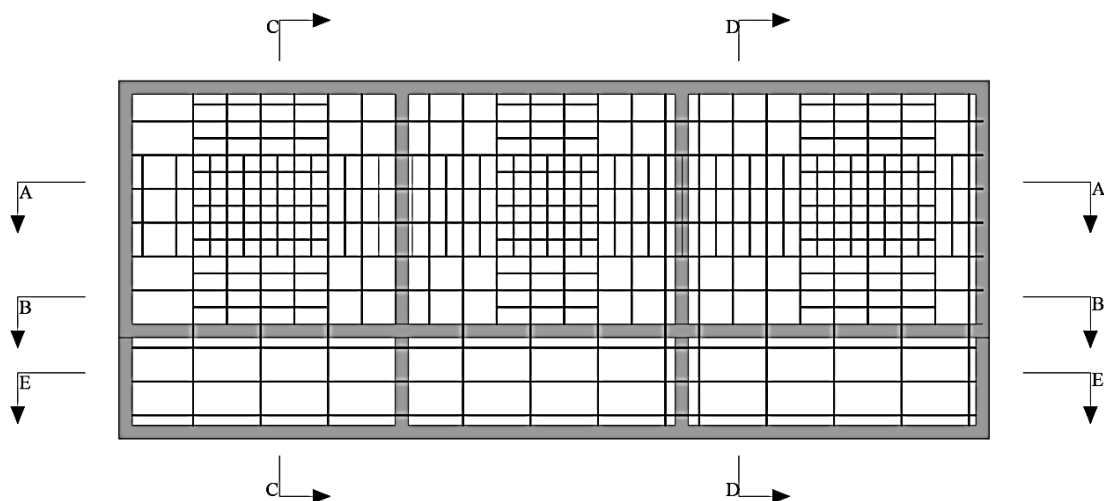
Plan view showing the distribution of longitudinal bars at bottom layer of slab
